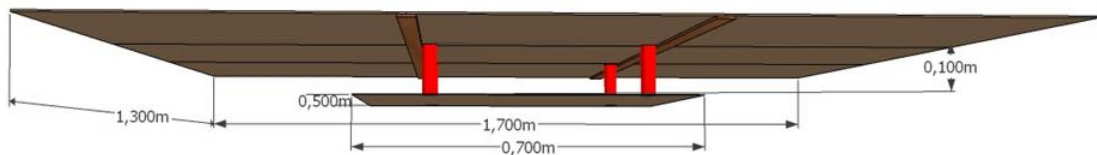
Side view sketch of the suspended ceiling and ceiling
